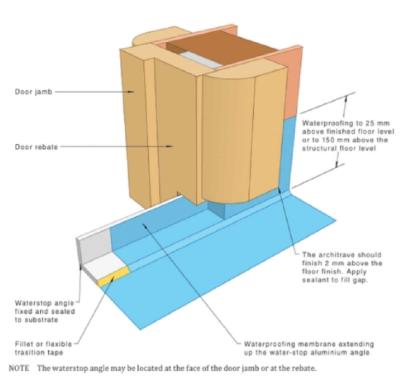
(A) — Example of liquid waterproofing at door opening framework
